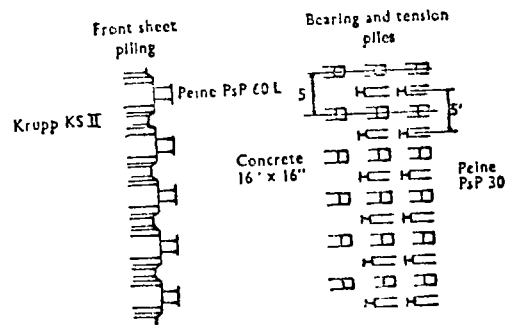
SWARTTOUW QUAY WALL: PILE LAY-OUT
